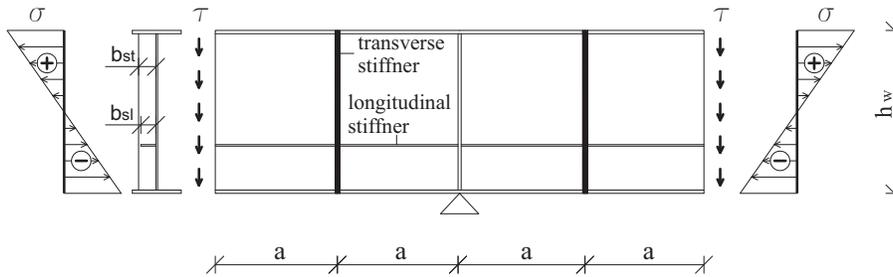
Numerical model of stiffened plate girder under combination of high bending moment and shear force
